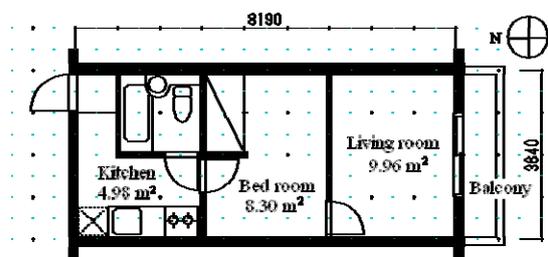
Example of the plan of the house (Apartment 29.88m<sup>2</sup>)
